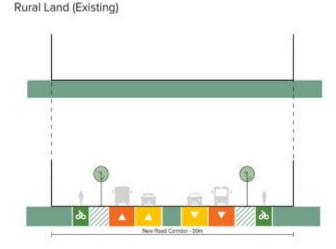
Overview of Ōpāheke N-S FTN Arterial Upgrade
